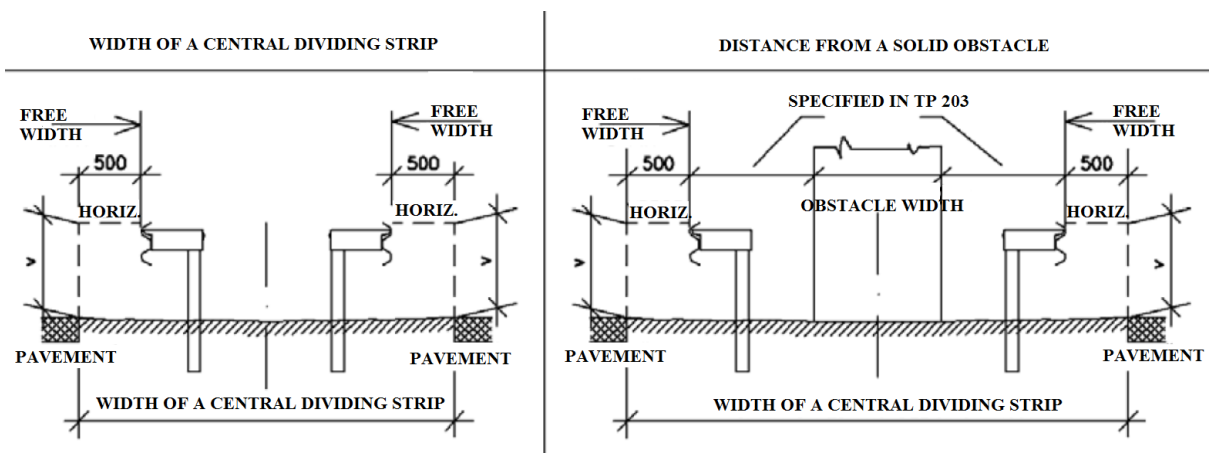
Single-sided crash barrier installation in a central dividing strip [54]
